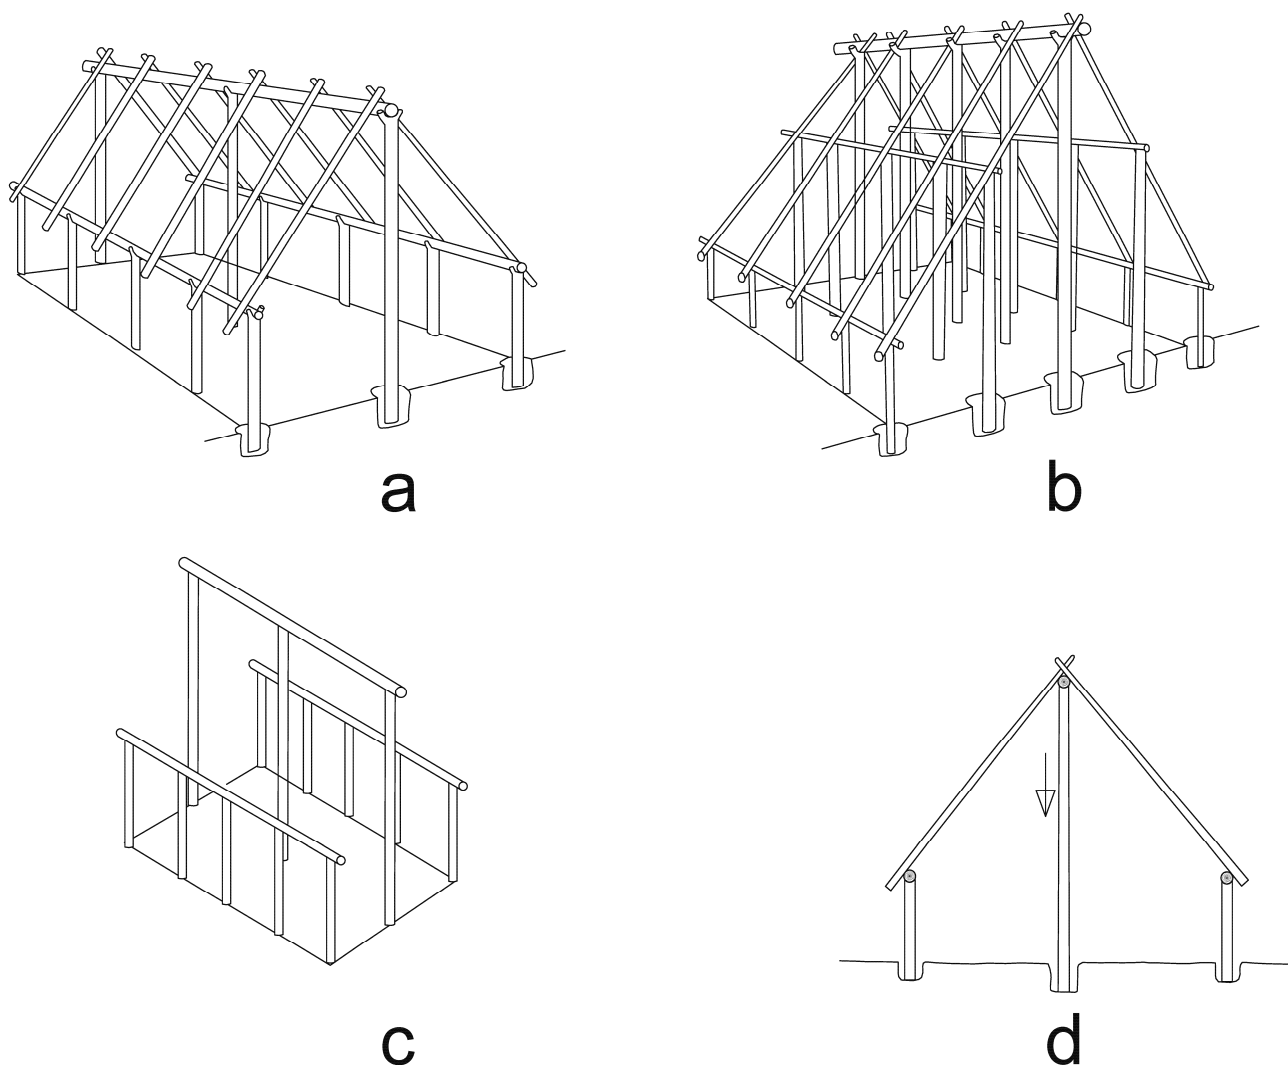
2. Two-aisled (a) (adapted from Audouze and Büchsenschütz 1992, fig. 27.1) and four-aisled (b) timber-framed buildings with embedded posts as part of a prop-and-ridgepole roof construction using longitudinal linkage; (c) the posts can be placed at irregular intervals, since what matters is their longitudinal alignment (adapted from Brunskill 1994, fig. d6b); (d) in this system, all the loads of the roof are exerted vertically downwards (adapted from Audouze and Büchsenschütz 1992, fig. 36.1).
